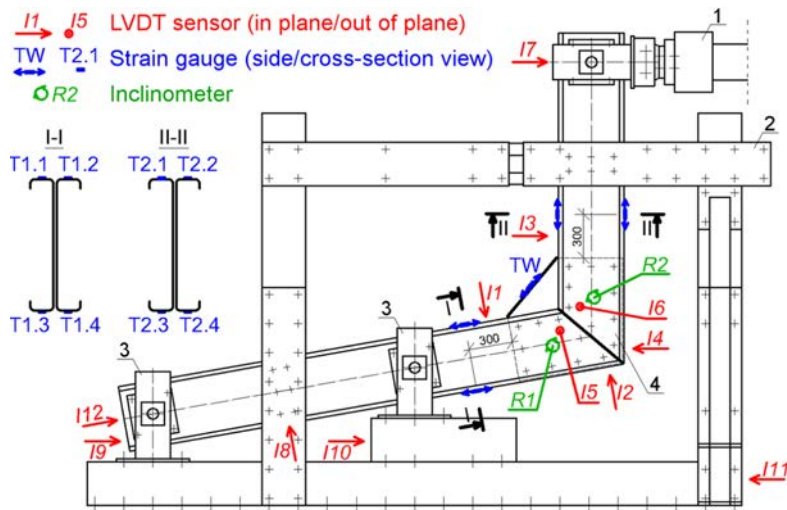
The instrumentation of the testing stand: 1 – hydraulic jack, 2 – rigid frame, 3 – simple supports, 4 – specimen
